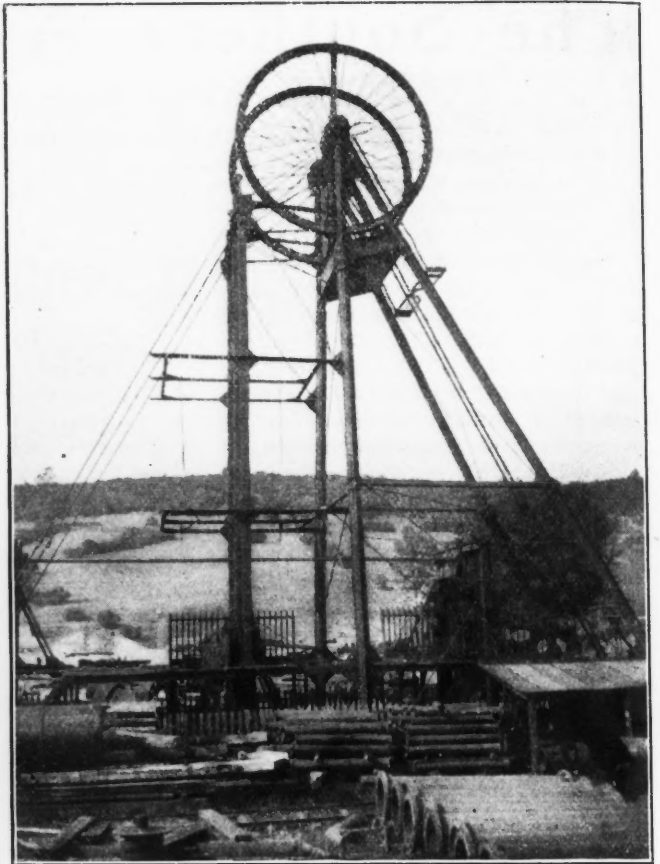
SIDE VIEW OF HEAD-FRAME OVER
